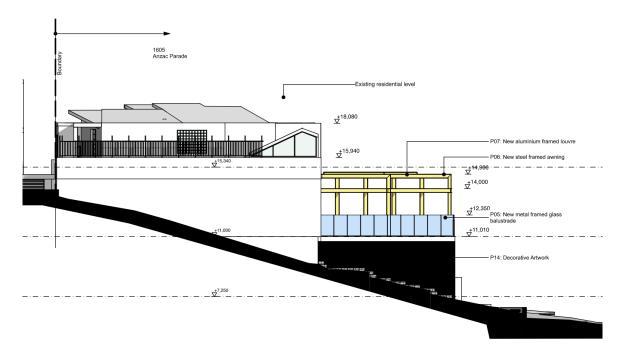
Proposed North-east elevation - 1605 Anzac Parade
